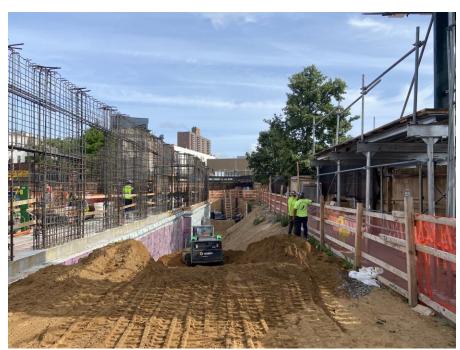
View of Legacy backfilling clean sand in the southeastern part of the site (facing north).
